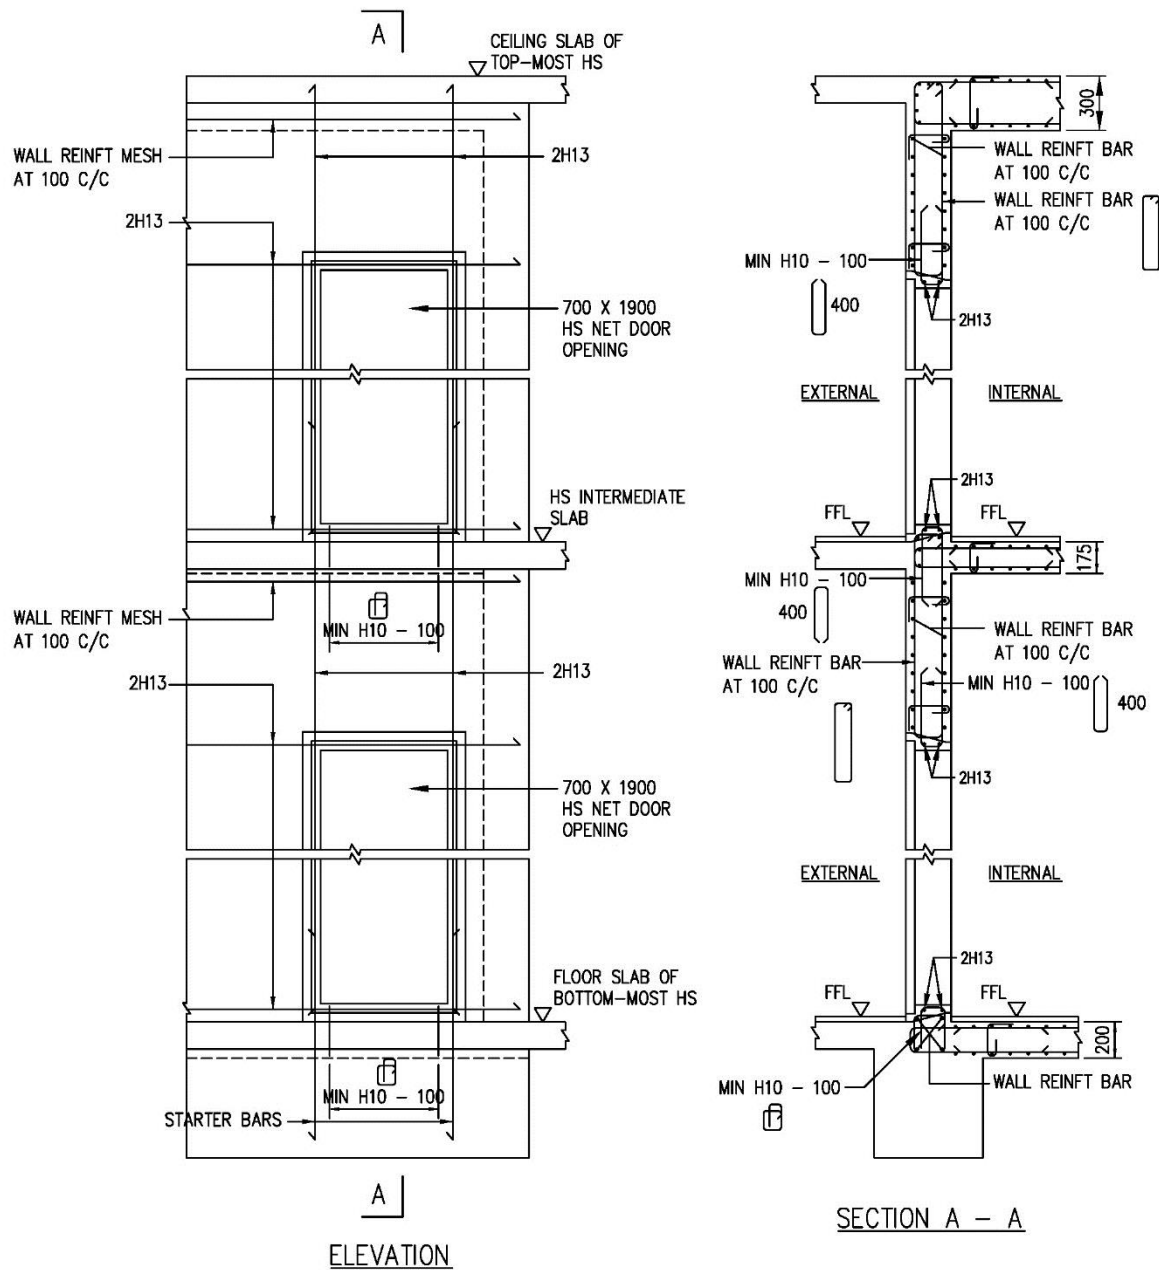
STEEL REINFORCEMENT BAR DETAIL FOR HS, SS AND SSS DOOR OPENING
